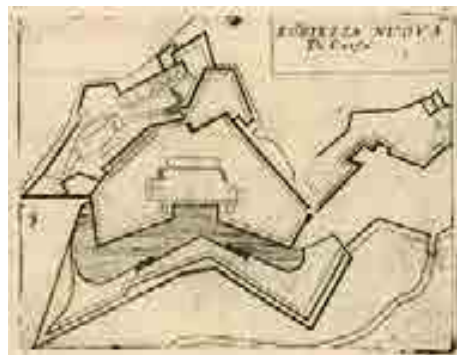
Floor plan of the Fortezza Nuova (New Fortress) in Corfu. (Coronelli, 1688).
